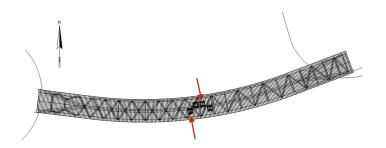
Placement of the dampers on the bridge, the installed dampers are indicated with red arrows.
